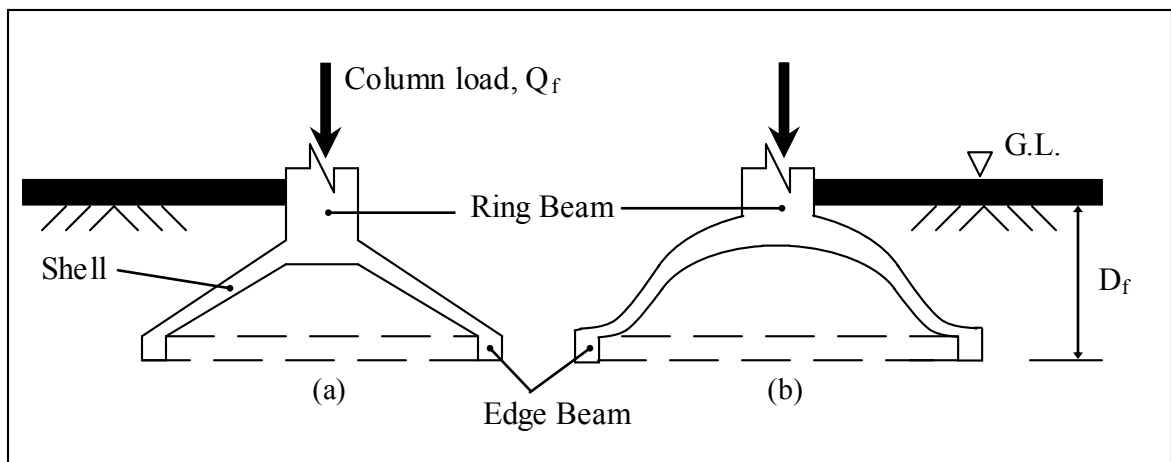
Shell Foundations: (a) Conical footing (b) Paraboloid of revolution footing.
